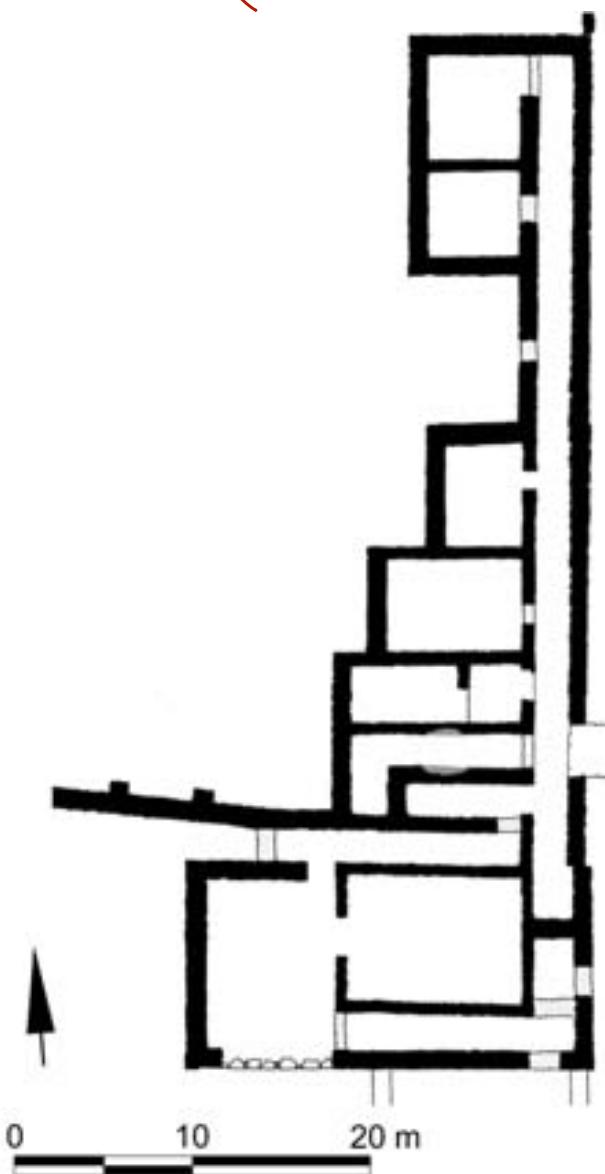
Buildings E and Z at Gla, adapted from Iakovides 2001, plan 19
